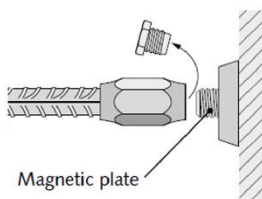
Fixing with magnetic or adhesive plate (formwork accessory)
